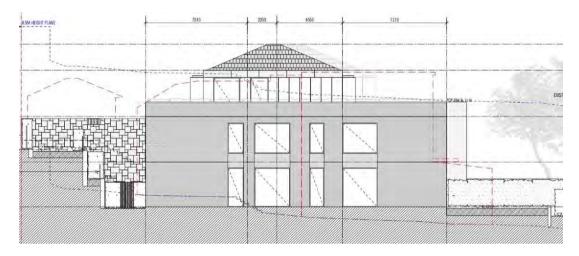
West Elevation displaying the roof which appears to be a minor element of the overall design (Plan DA11 Mathieson Architects).
